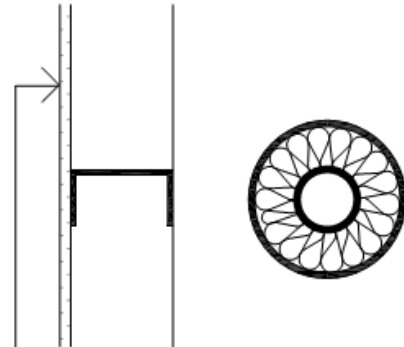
Construction for pipes running through ceiling of habitable spaces
